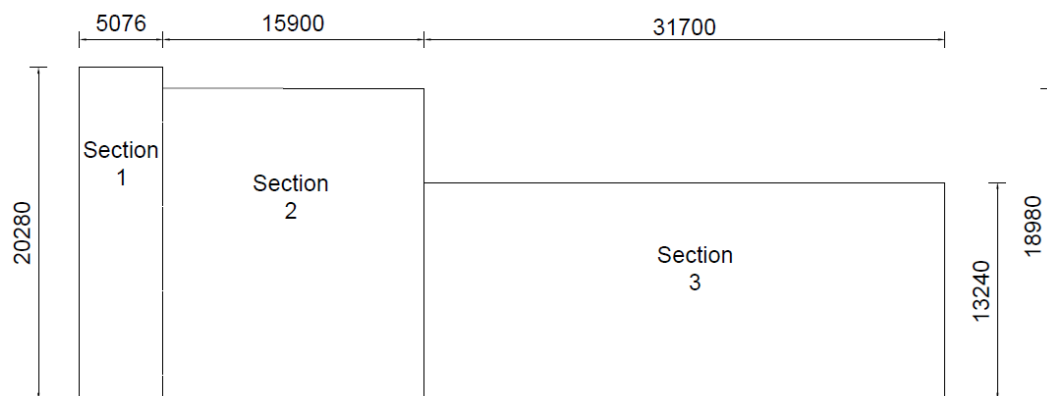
DISTINGUISHABLE SECTIONS MONOLITH STRUCTURE
